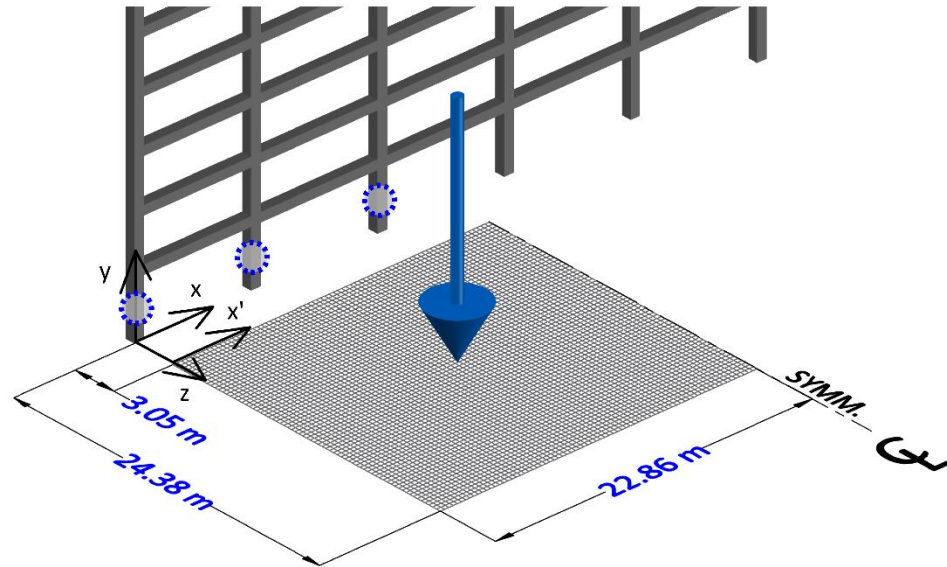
Isometric view of prototype building frame showing grid used for generating standoff contours for first floor column damage
